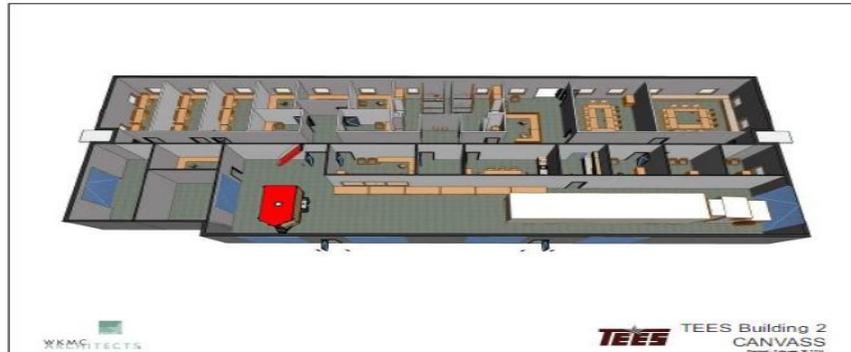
Floor Plan of the Initial Phase of CANVASS Building
